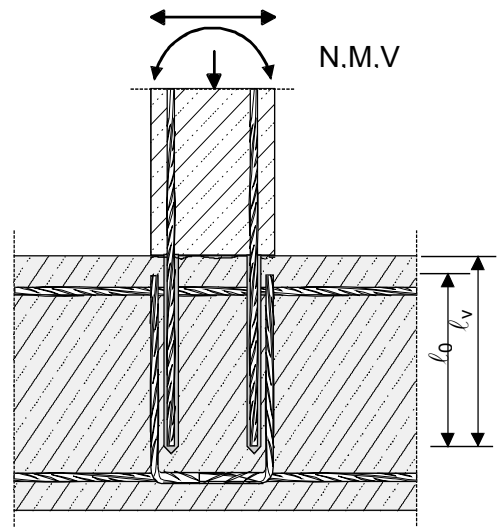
Overlap joint at a foundation of a column or wall where the rebars are stressed in tension
